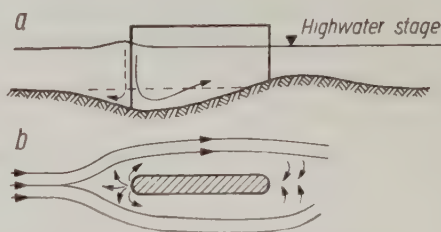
Water discharge near the bridge pier: a — cross section, b — top view,
